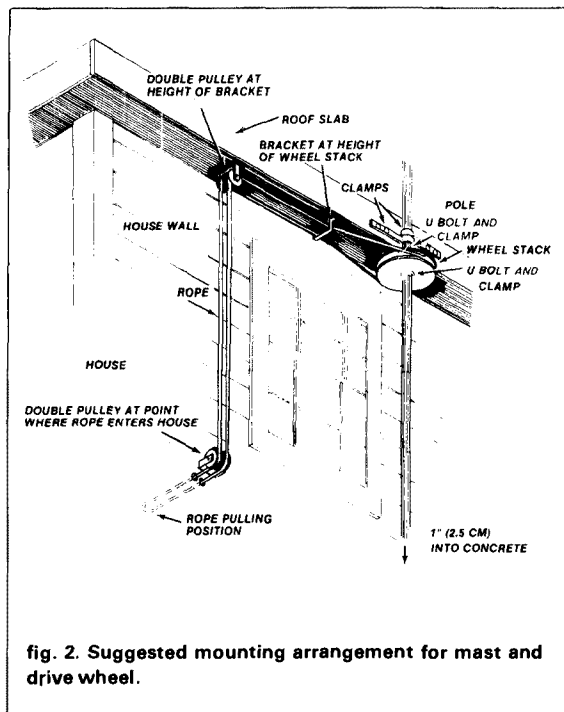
Suggested mounting arrangement for mast and drive wheel.
